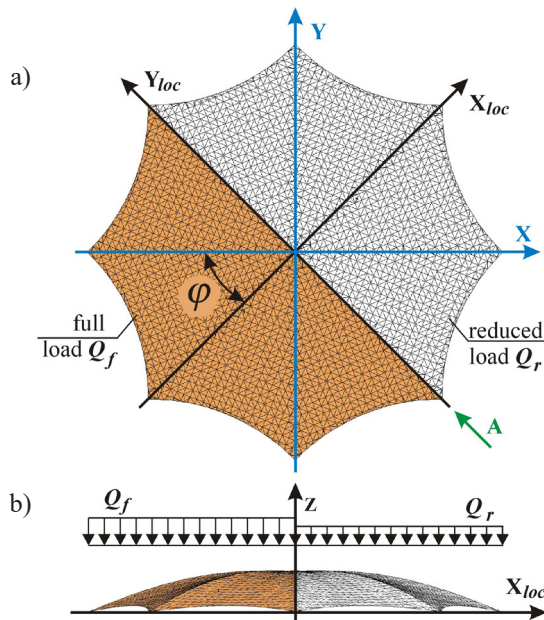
External loads: a) plan view of the load zones; b) view along the line A
